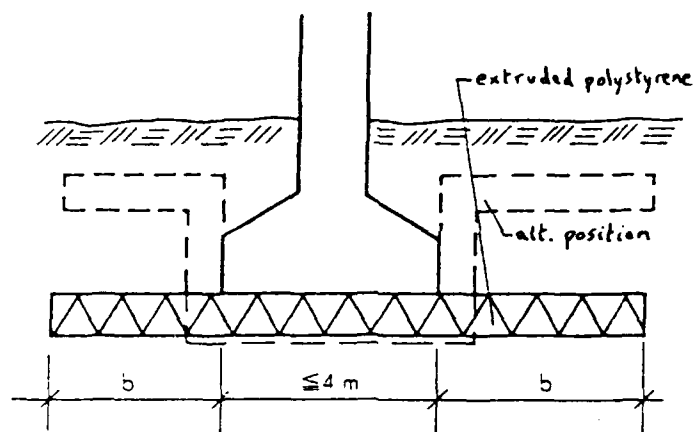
Alternative placing of insulation for a narrow strip foundation.
